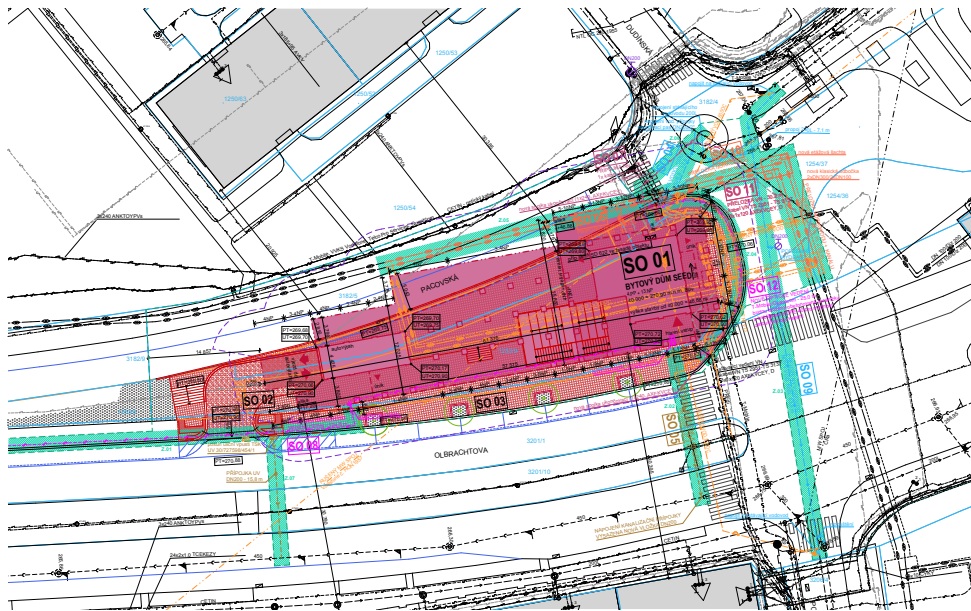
Site plan, Source: SEED residential building project documentation. Author: Ing. arch. David Buroň, 2025
